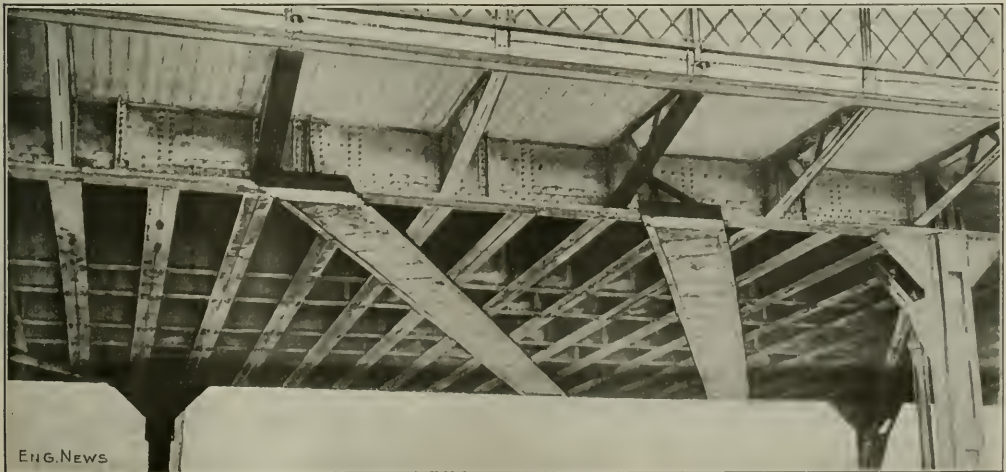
UNDER FLOOR OF HAMBURG TURNPIKE VIADUCT, BUFFALO, N. Y., SHOWING CAST-IRON BLAST PLATES AND CEMENT GROUT OVER RED-LEAD OIL PAINT
